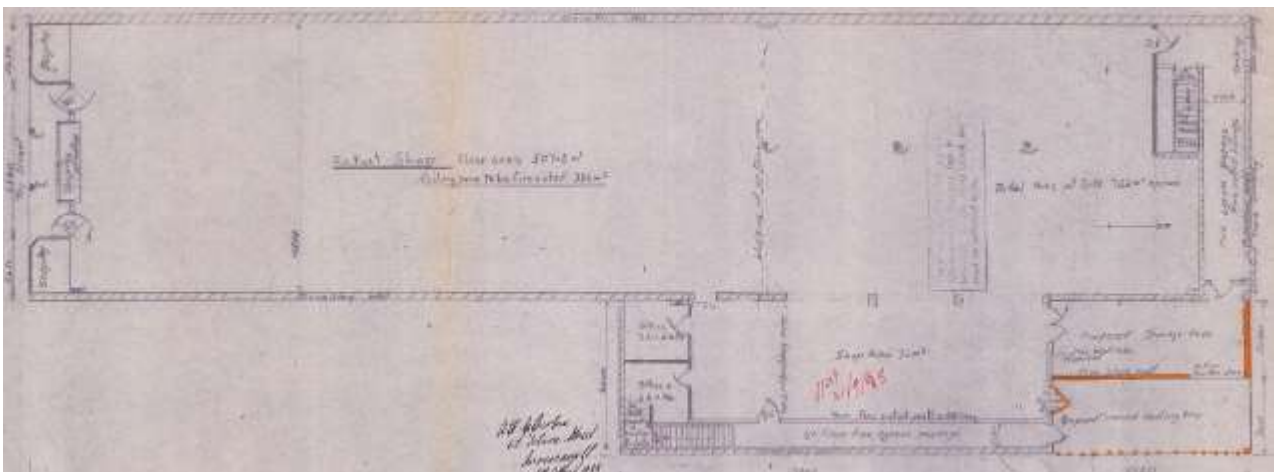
Building Ground Floor Plan from 1988 drawing by Untitled.
